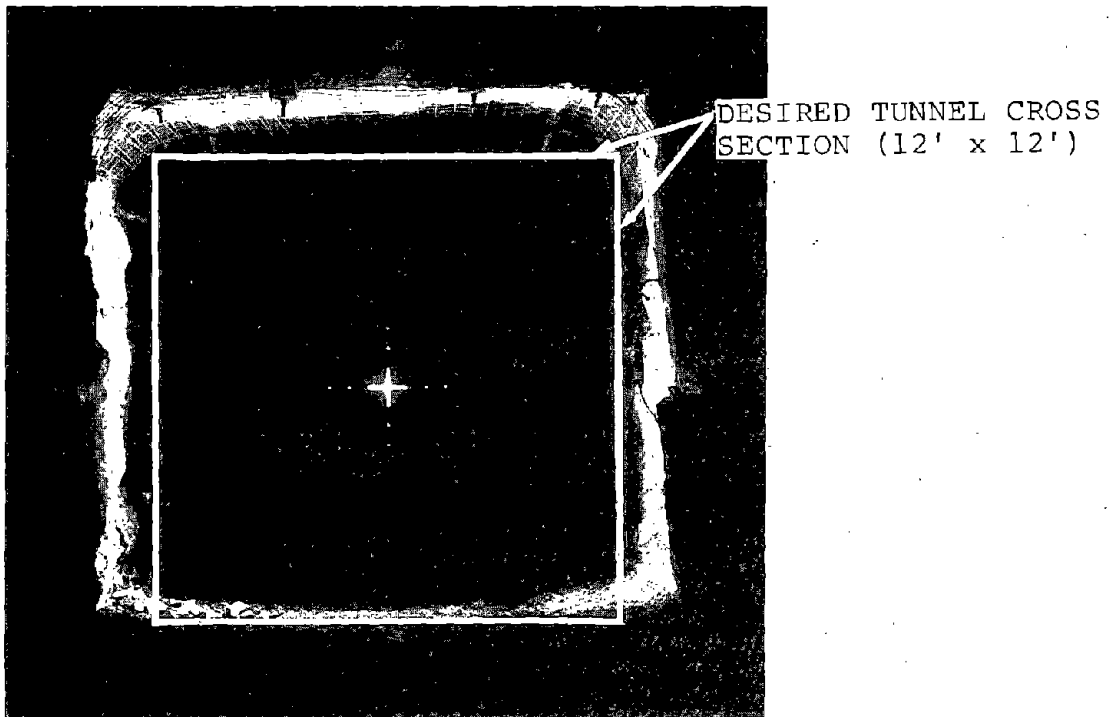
TYPICAL TUNNEL SILHOUETTE PHOTOGRAPH
